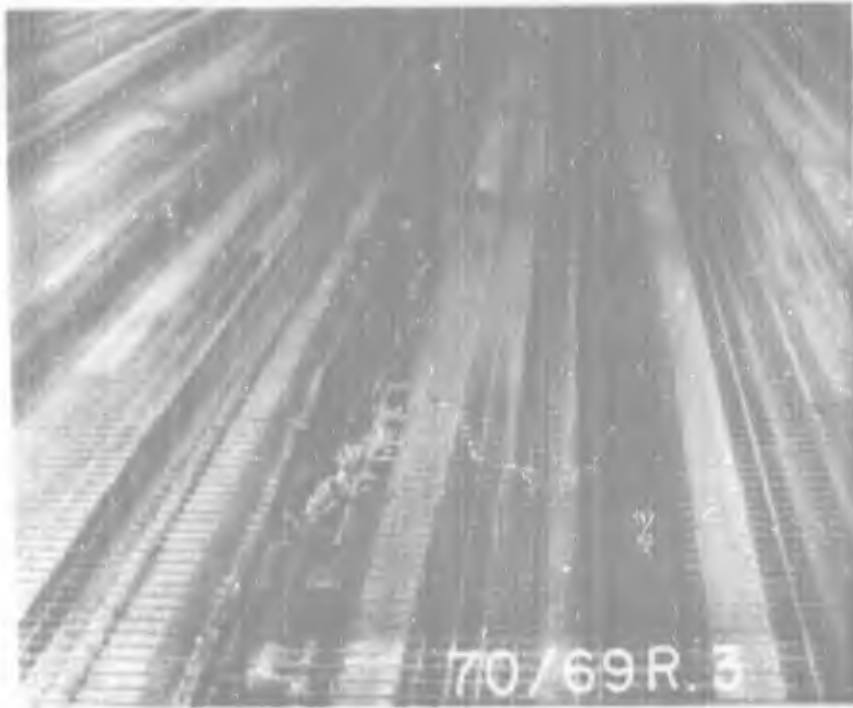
Spalling along center longitudinal joint of runway
